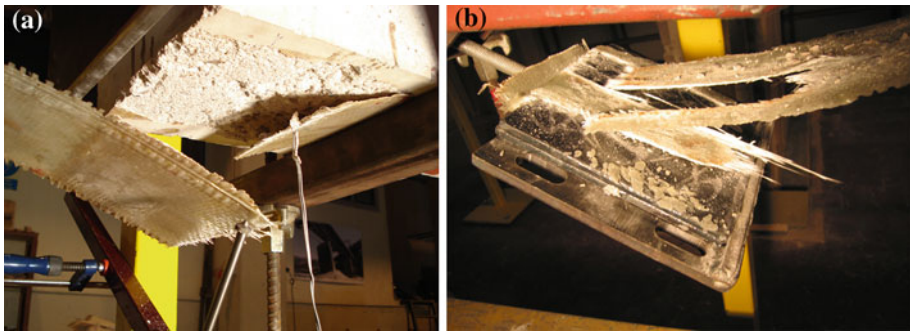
(a) GFRP tensile fracture—test M75-2-120 M1 (T failure); (b) GFRP cut due to stress concentration in the edges of the anchoring device set on the dummy steel block (P₁ failure)
